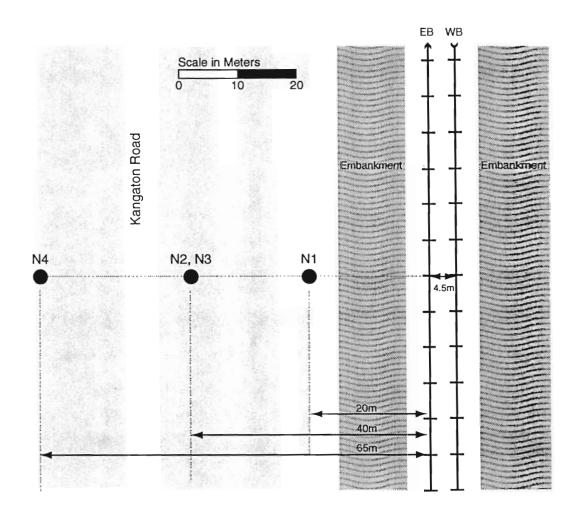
A. PLAN VIEW OF SWEDISH MEASUREMENT SITE 2
